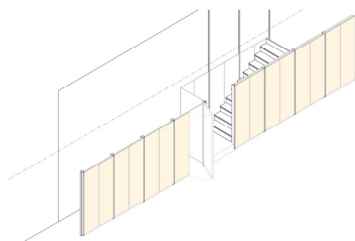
Deep storage wall containing the stairs and utilities provides a buffer to the north of the house
